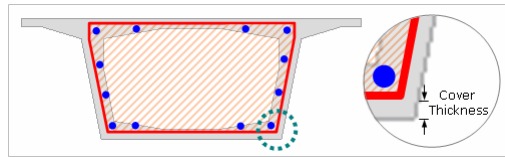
40 Reinforcement Close against Outer Closed Stirrup
